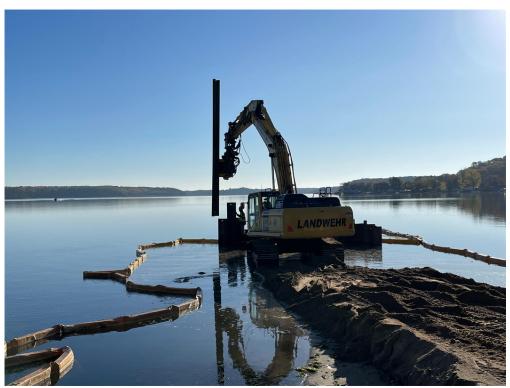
Installing Sheet Pile Wall for Inlet - Oct 16, 2023, 9:23 AM
